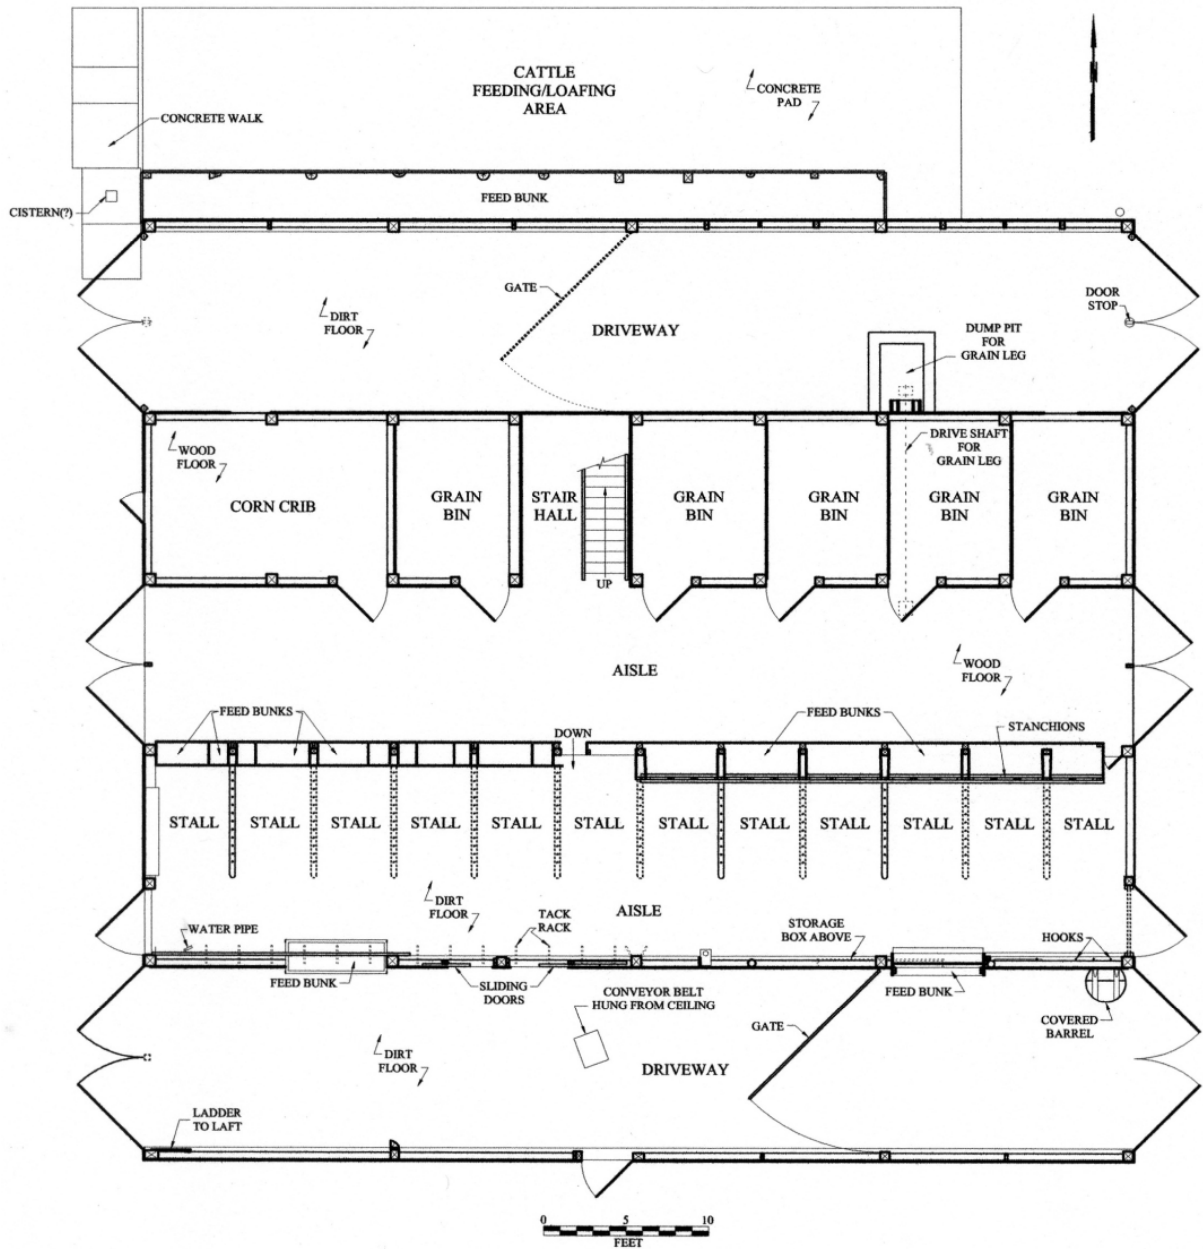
First floor plan of the Moore-Knobeloch Barn showing conditions in 2007.
